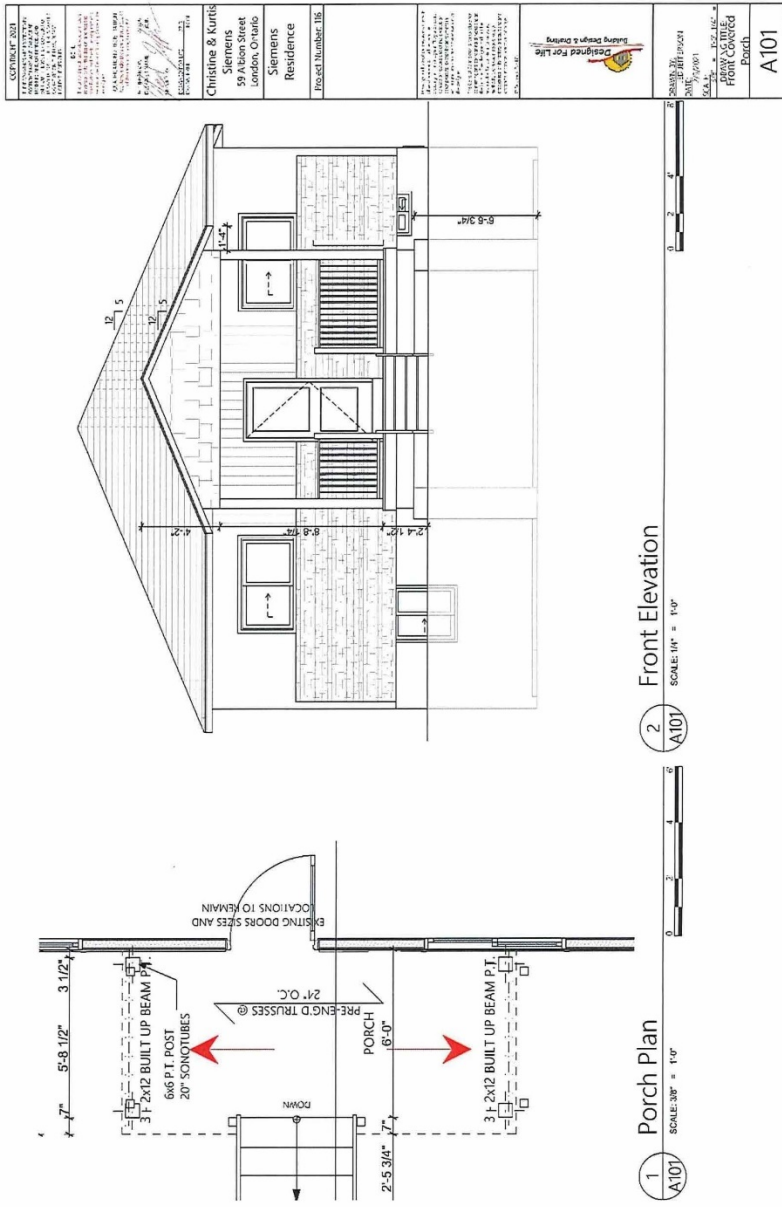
Drawings submitted as a part of the Heritage Alteration Permit application for the property at 59 Albion Street, showing proposed front porch.
